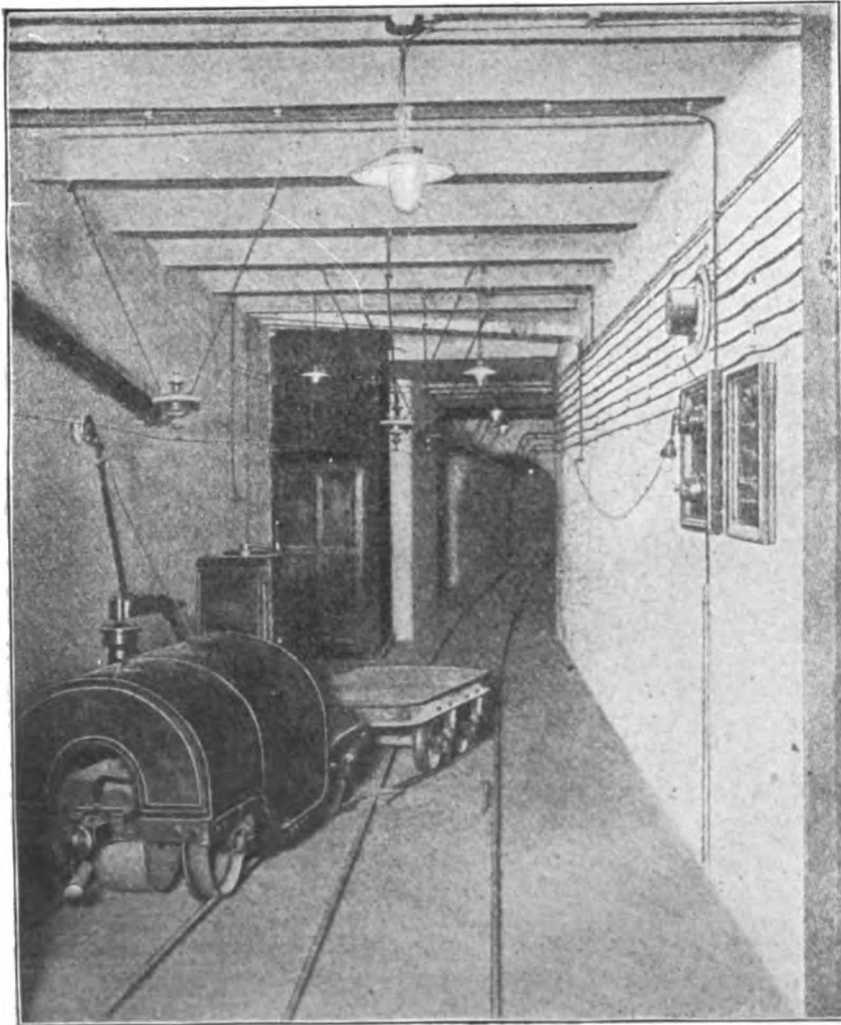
Tunnel with Electric Railway connecting the Buildings of the Bread Factory of J. Halseth, Dronheim.
